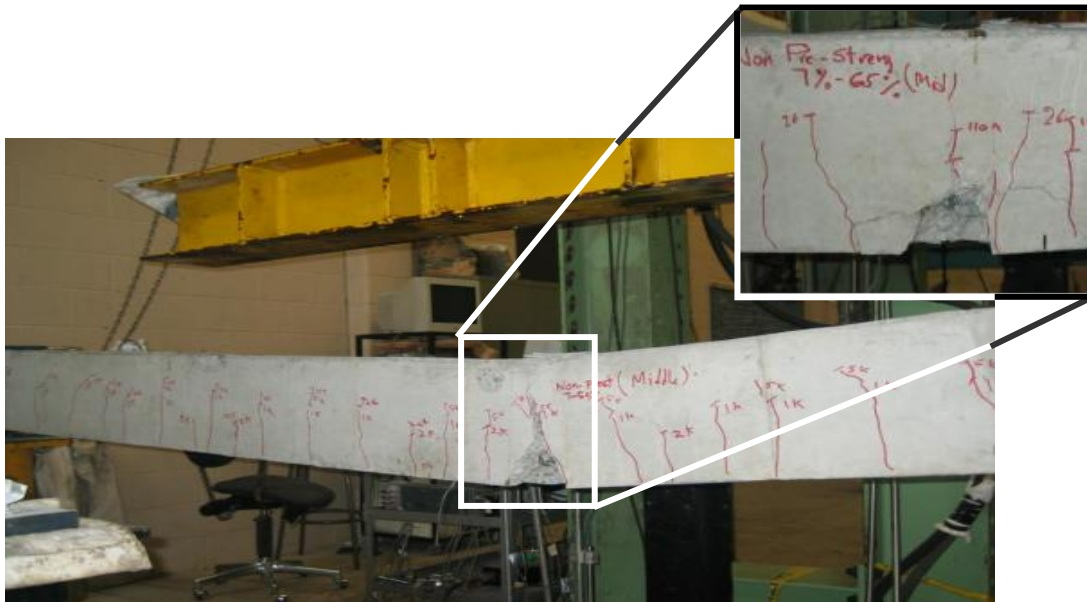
Fatigue failure due to a rupture in the reinforcing steel bar
